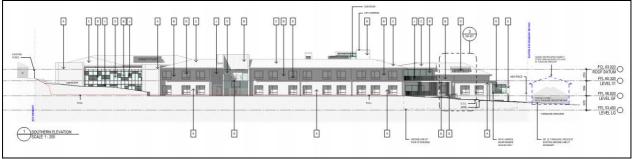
Southern Elevation (Source: Jackson Teece, 2019)
